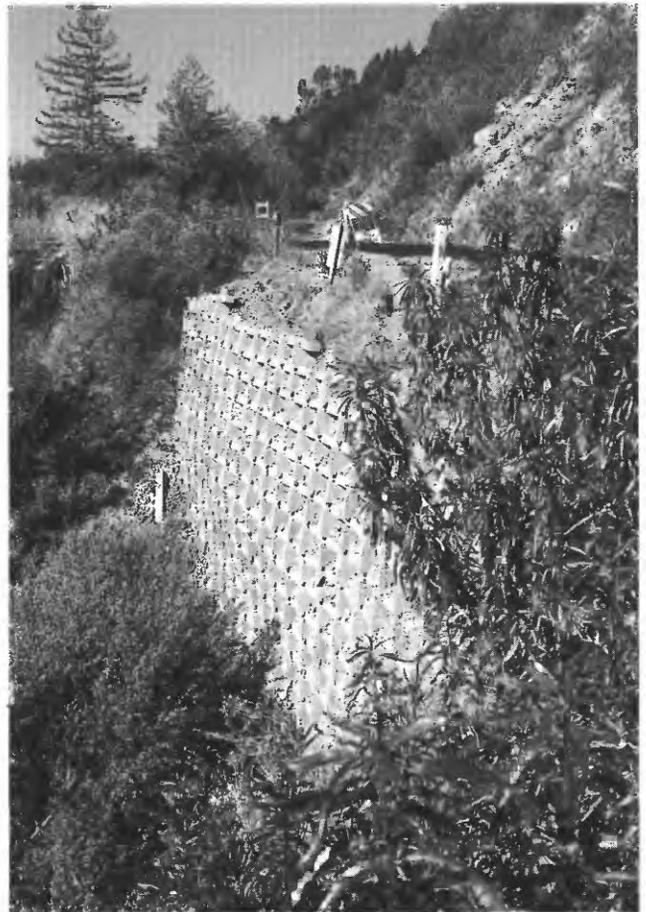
Crib wall (courtesy of Earthquake Engineering Research Institute).
